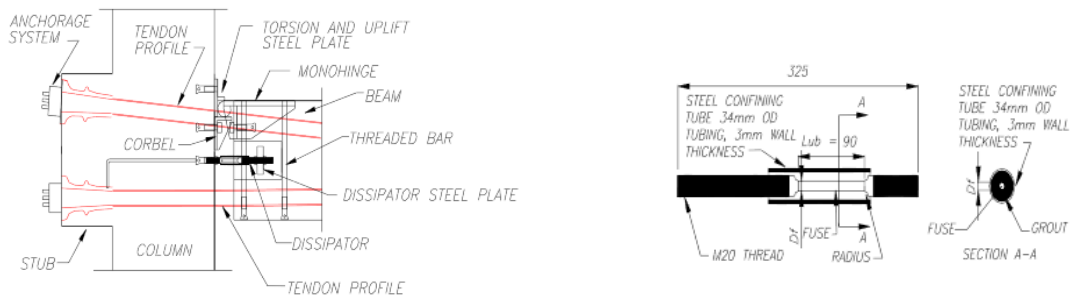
Connection Detail (left) and Dissipator Detail (right) [27]
